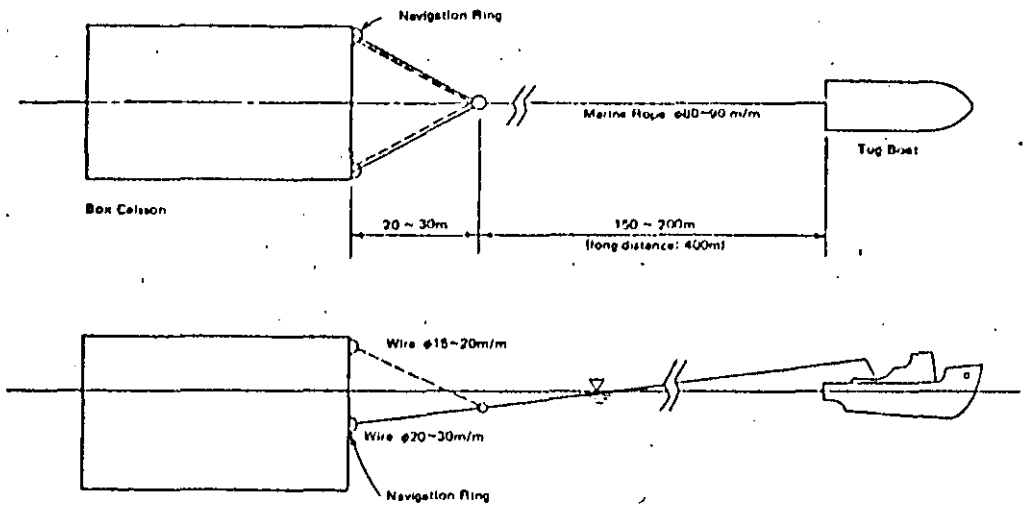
Towing Operation of Box Caisson by Navigation Ring Method
